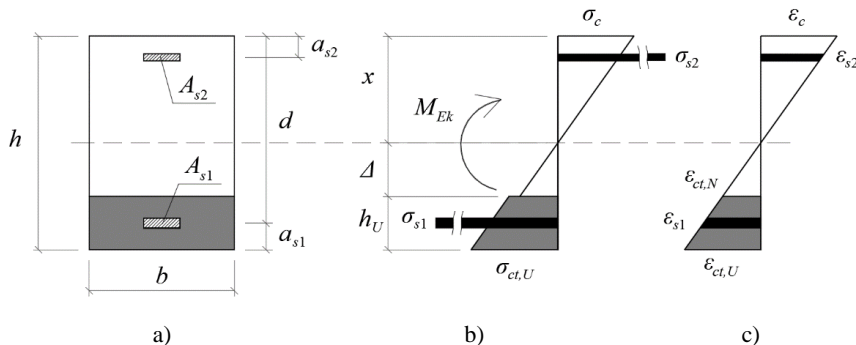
Reinforced concrete composite member cracking moment calculation scheme, when the first cracks open in the layer of ultra-high performance concrete: a) cross-section of reinforced concrete composite member, b) stress in uncracked section, c) strains in uncracked section
